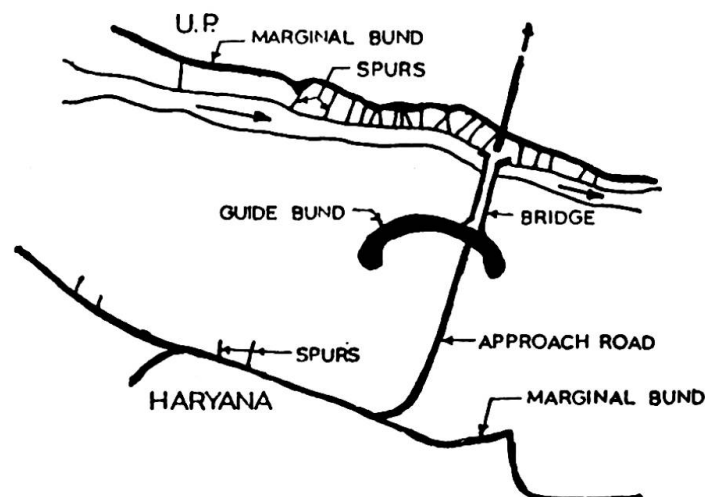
LAYOUT PLAN OF YAMUNA BRIDGE AT KARNAL
